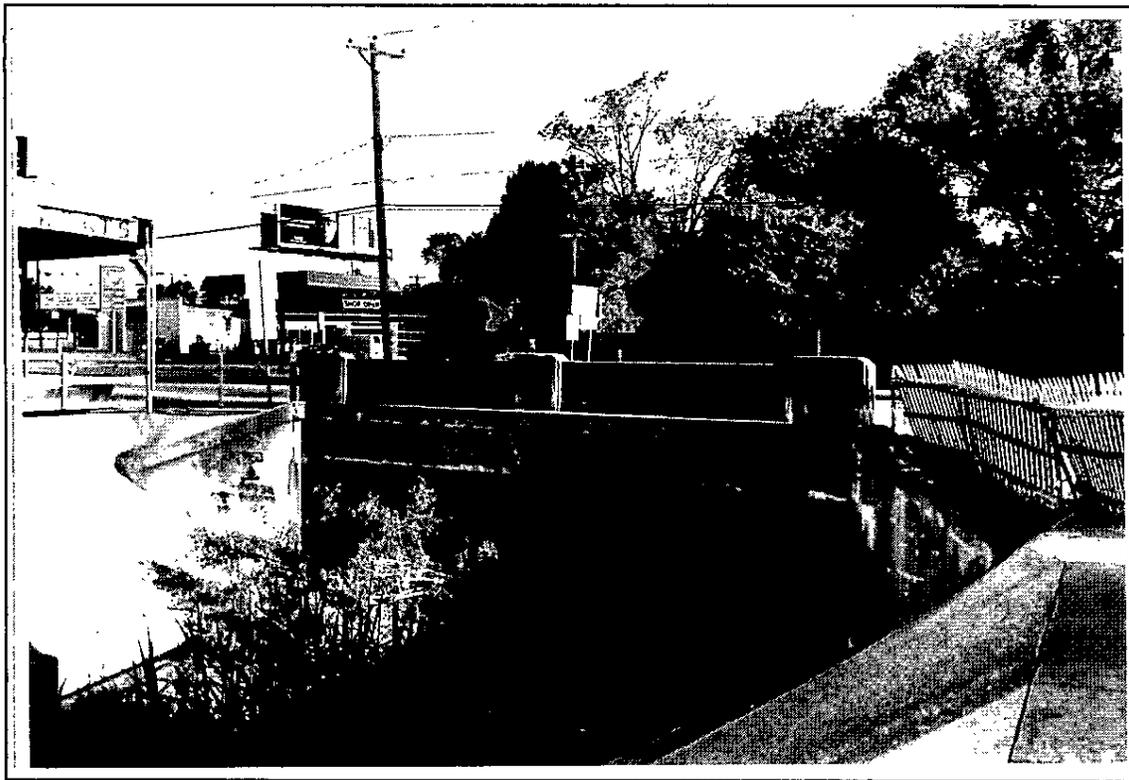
State Bridge Number 153 (N-12395), South Elevation, North View
